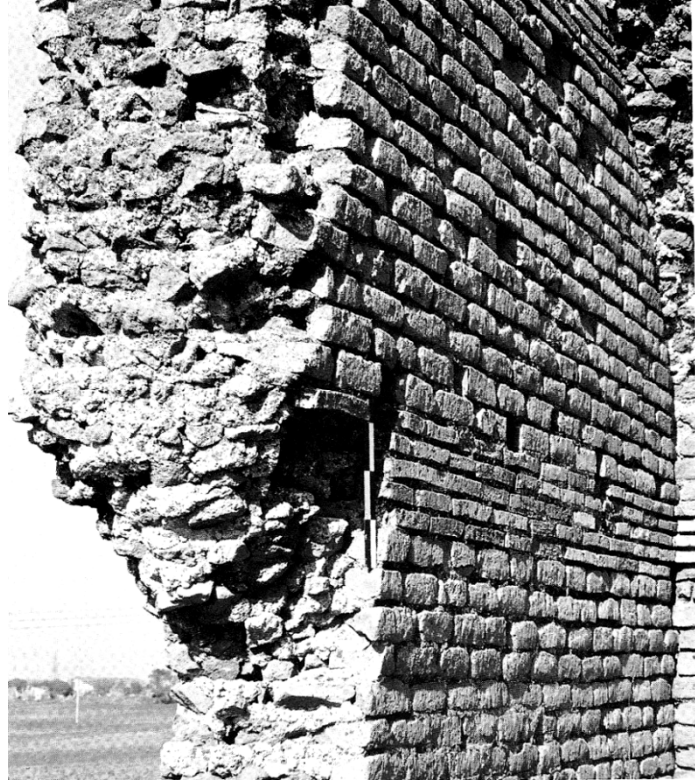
Masonry wall in ancient Roman period (Adam, 2005: 78)
